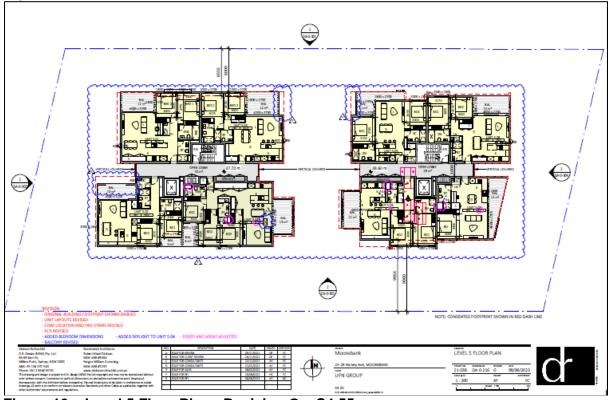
Level 5 Floor Plan - Revision G - S4.55
